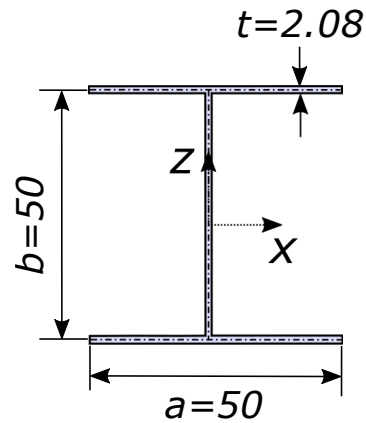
Geometry of thin-walled I-shaped beam (dimensions in mm)
